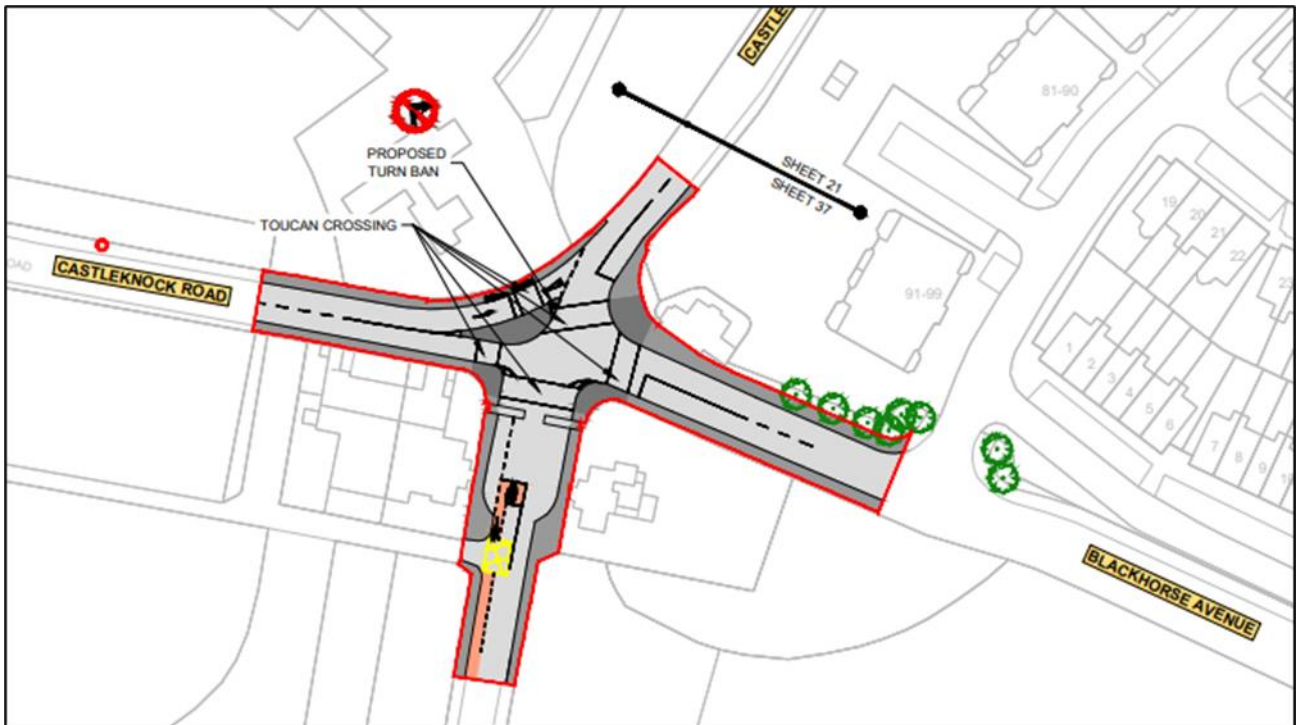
Extract from General Arrangement Drawing at Castleknock Road / Blackhorse Avenue Junction
